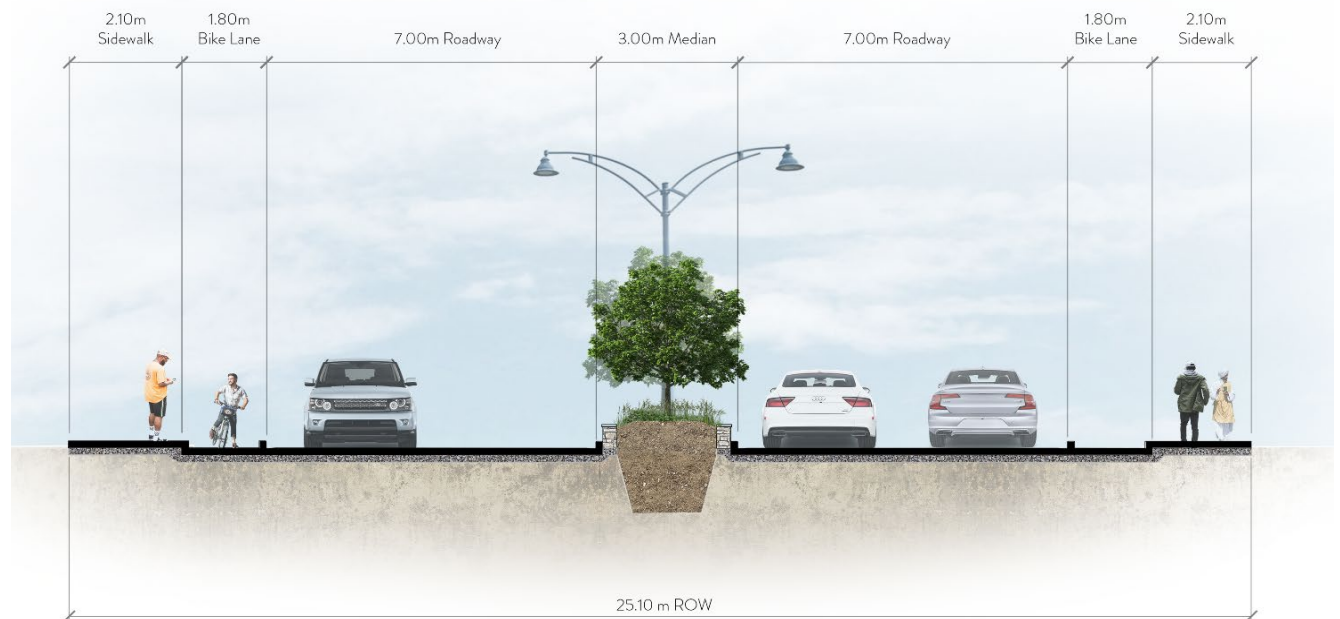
Collector Road Cross Section: Clarington Boulevard
